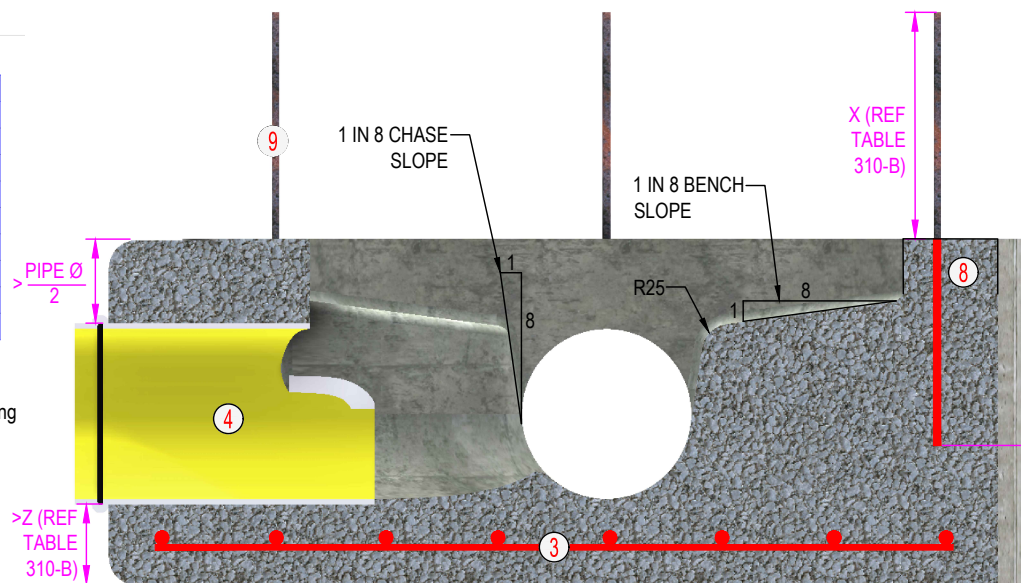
B: TYPICAL MANHOLE BASE (SECTION VIEW)
